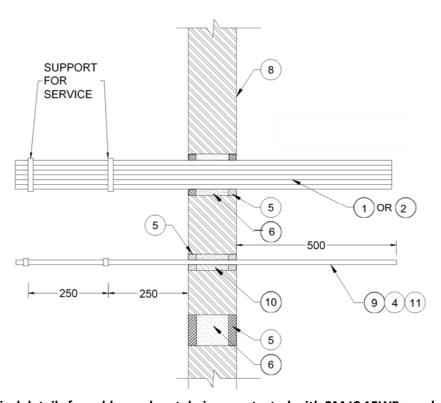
Typical details for cables and metal pipes protected with 3M IC 15WB+ sealant for masonry walls 150mm thick
